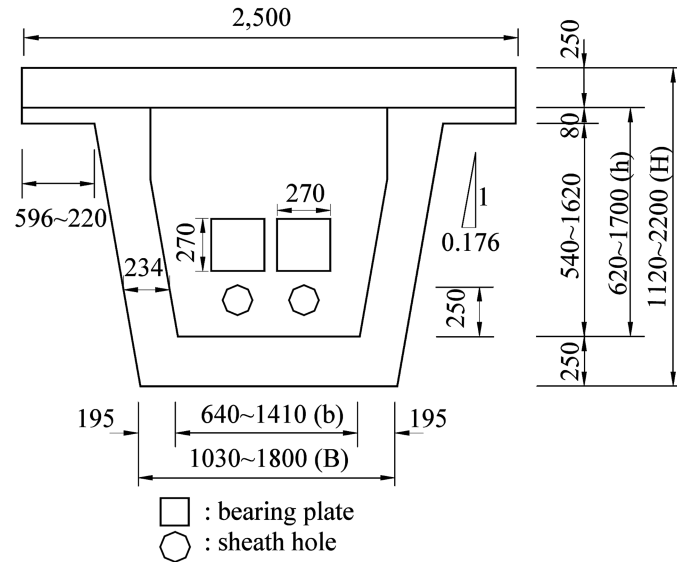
Basic geometry of U-shaped girder including slab (unit: mm)
